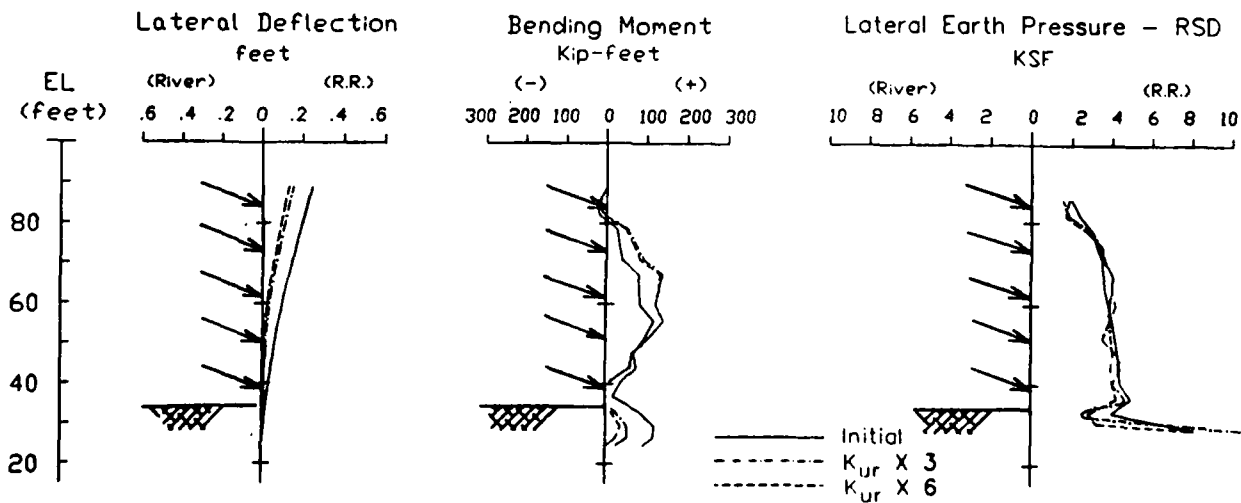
Deflection, moment, and earth pressure for Panel 11, load step 15; prestress anchor at el 38.67 ft
